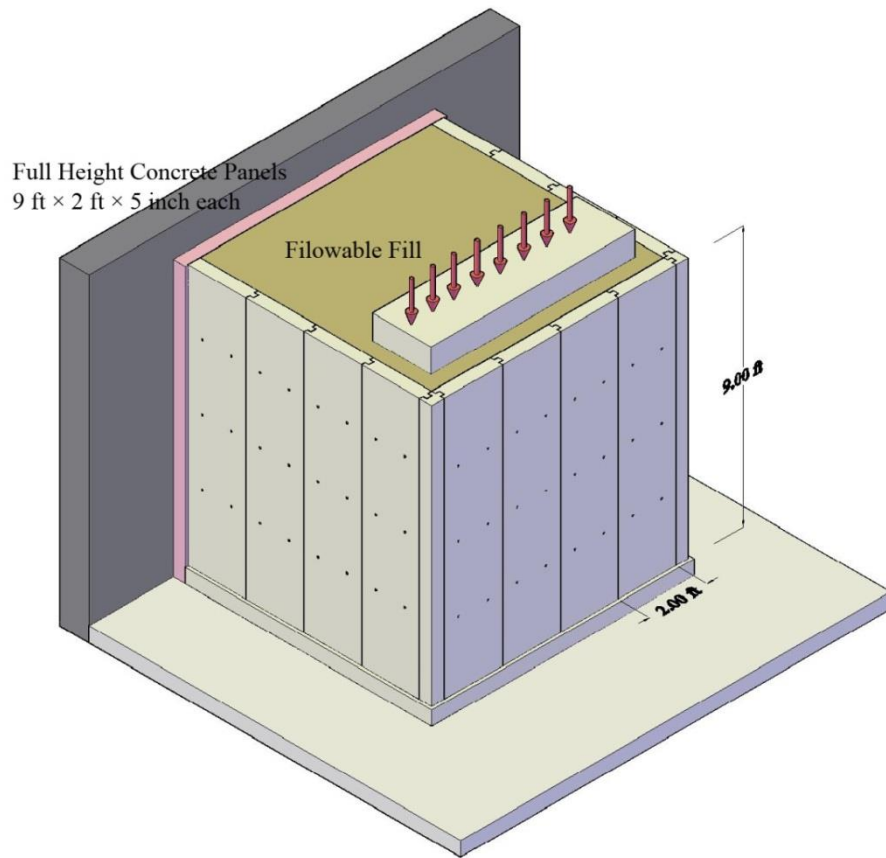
Large-scale laboratory test of CLSM bridge abutment (1ft = 0.3048 m).
